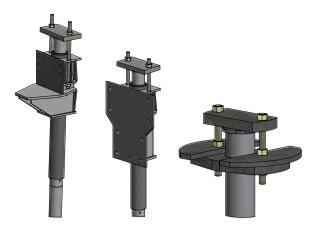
a Left to right; typical under-footing,flush-mount and slab pier brackets (no relative scale)
